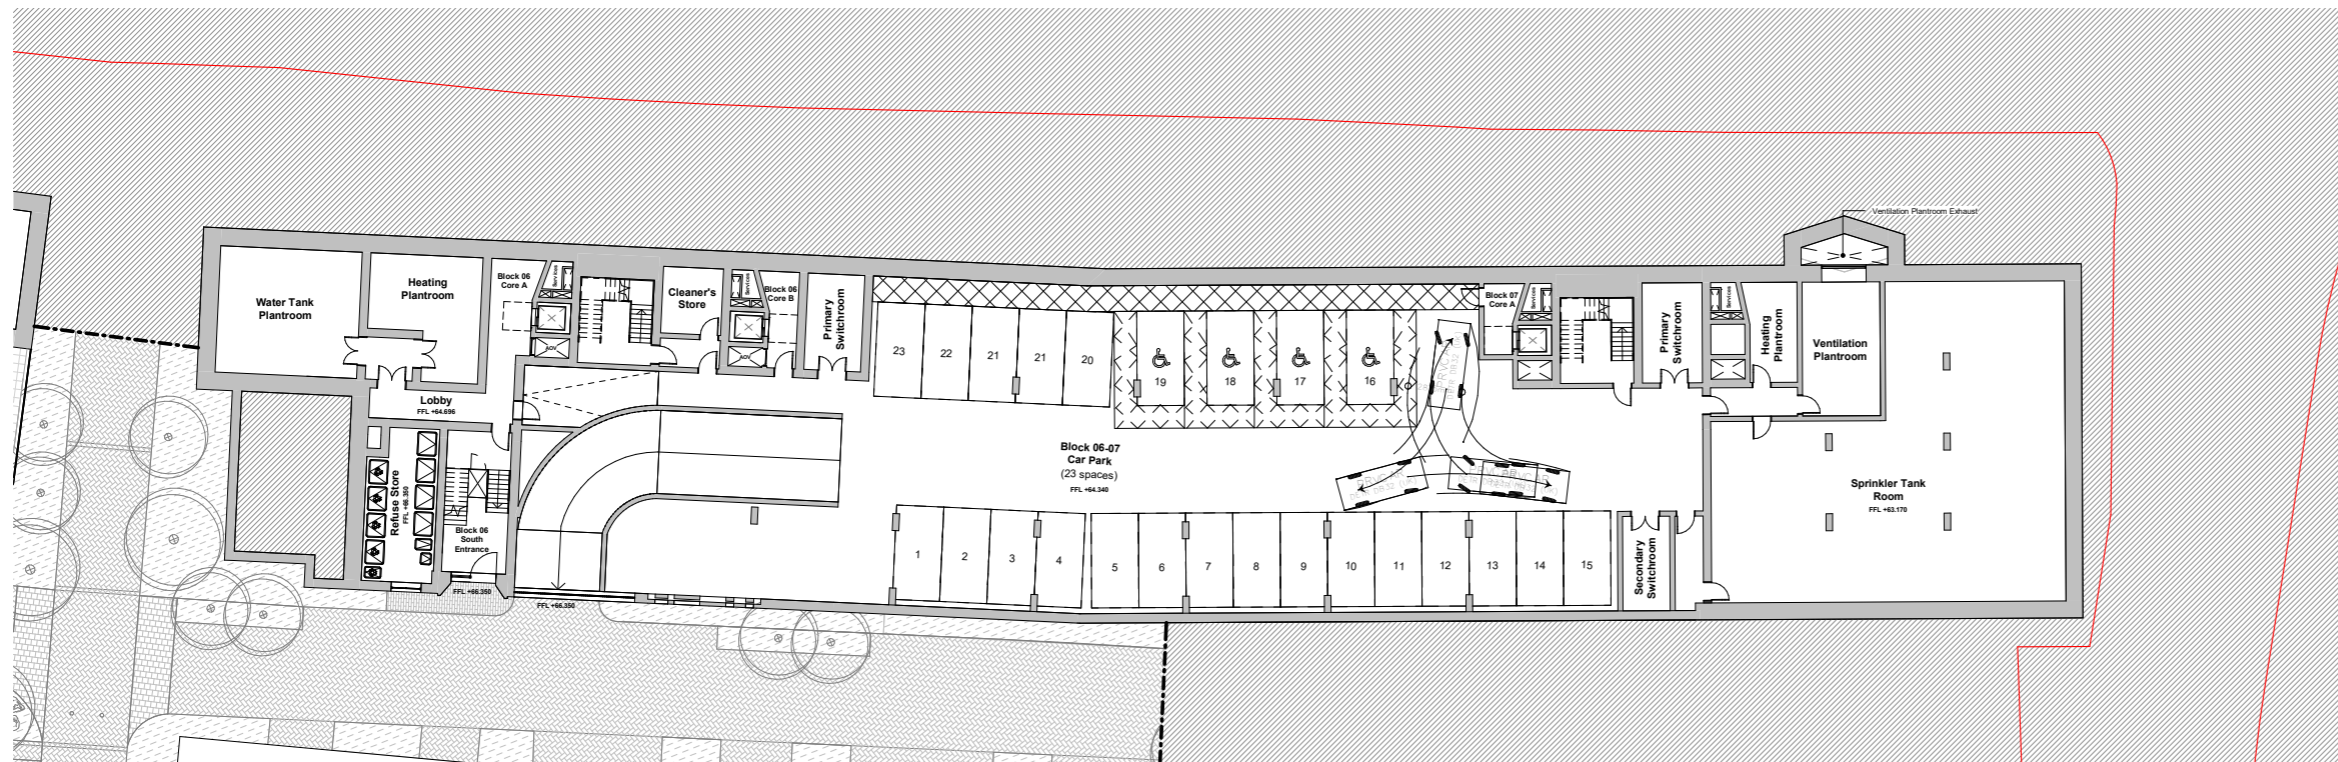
Block 6 & 7 Basement Floor Plan as approved
